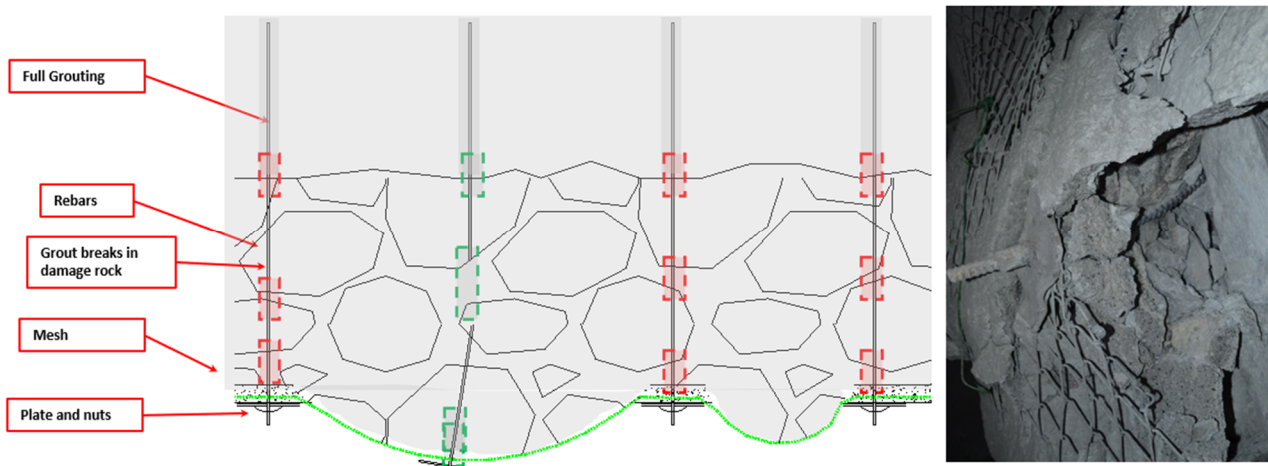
Working scheme of the interaction of the reinforcement, when the rock failure occurs in the tunnel
